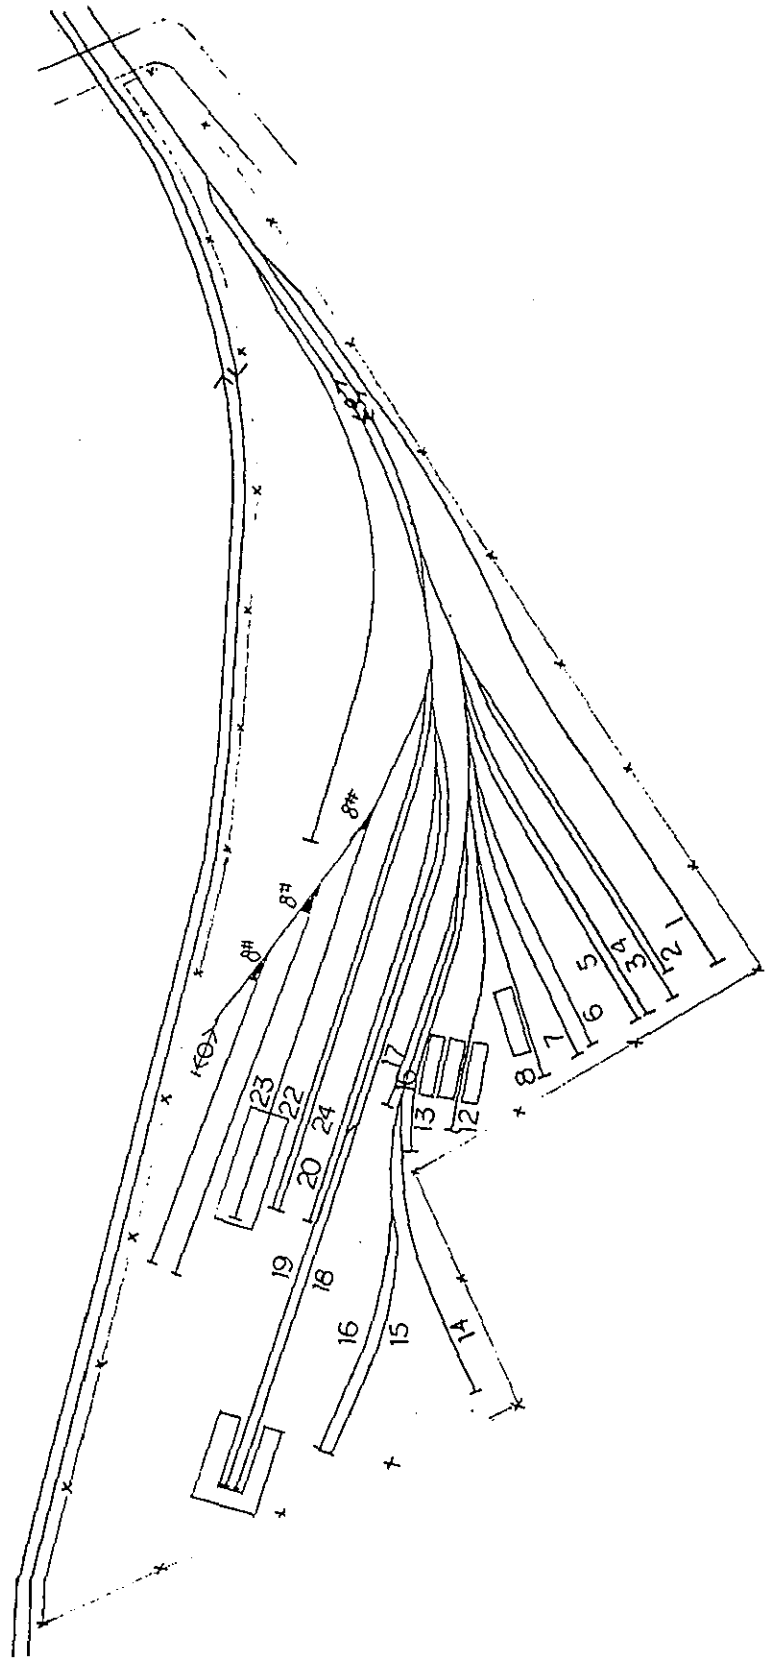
TRACK LAYOUT SKETCH MAP
